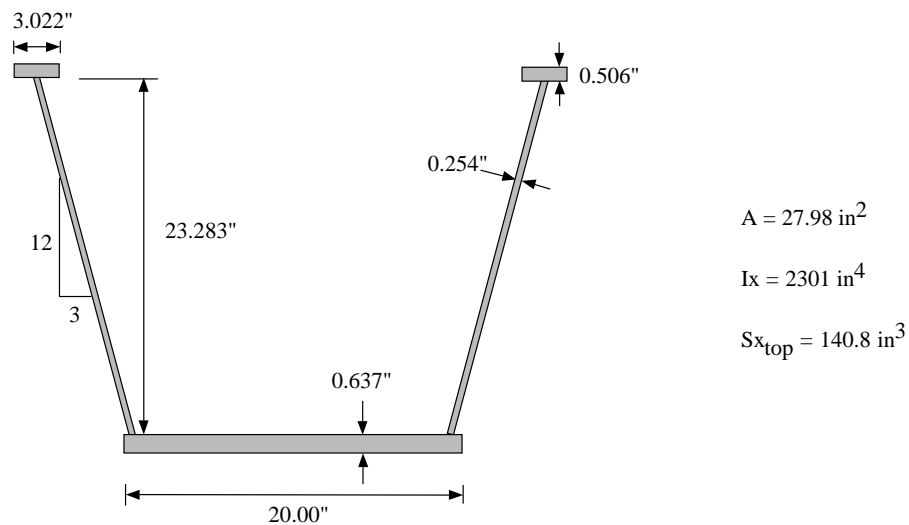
Cross-Sectional Properties of Trapezoidal Girder
